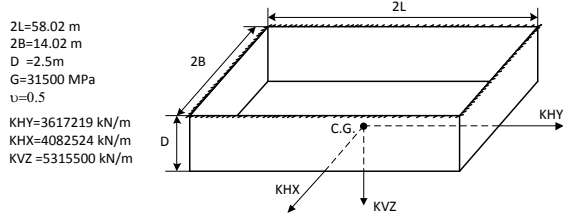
Rectangular embedded foundation ($L \geq B$).
